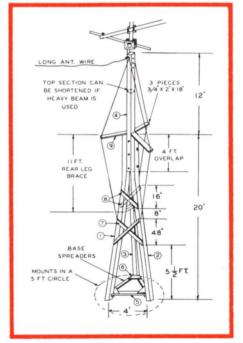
ASSEMBLY DRAWING for the tower. Dimensions of all wood parts are given in TABLE I.
